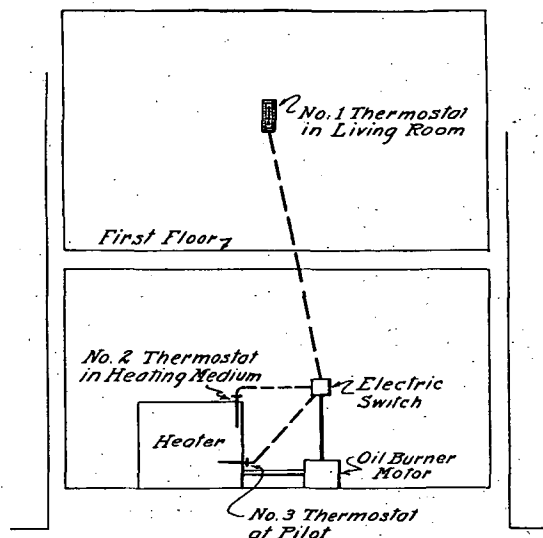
TYPICAL ARRANGEMENT FOR OIL BURNER
